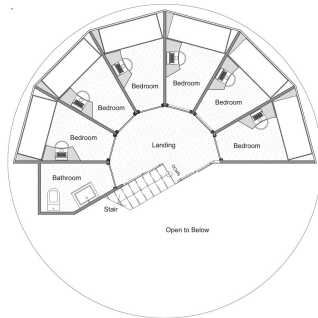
HI-SEAS second-floor plan showing six bedrooms and one washroom.
